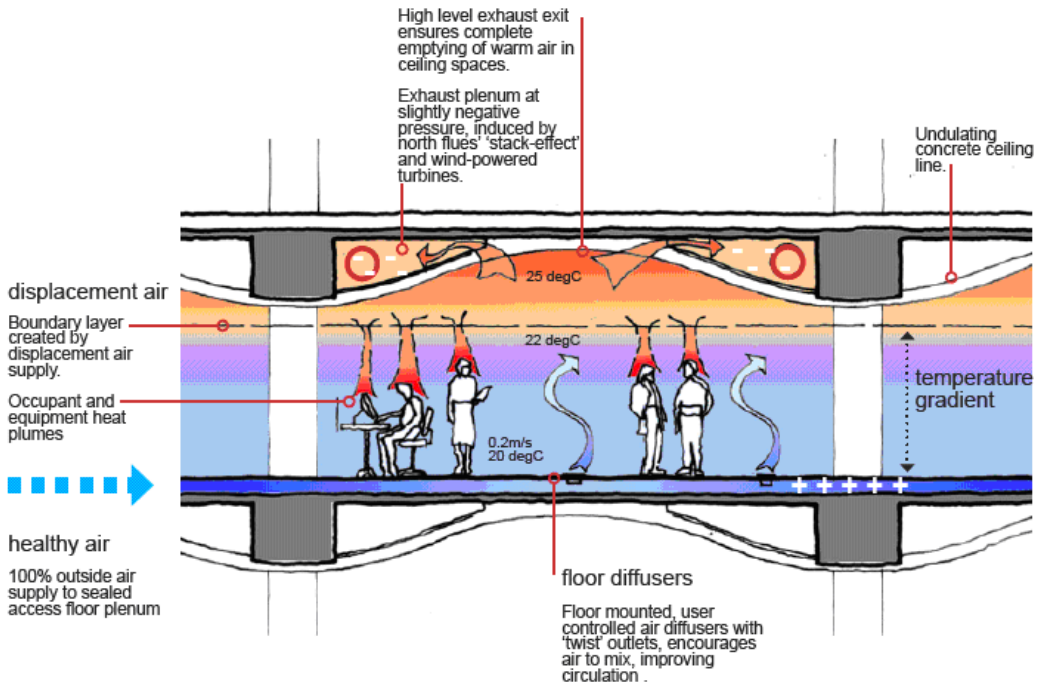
Air is supplied to offices from south façade ducts through floor diffusers and exhausted through ducts in the ceiling and then to the north ducts²¹
